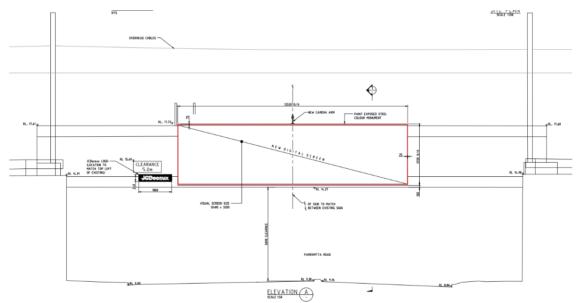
Proposed sign architectural plan (Source: Dennis Bunt Consulting Engineers)
